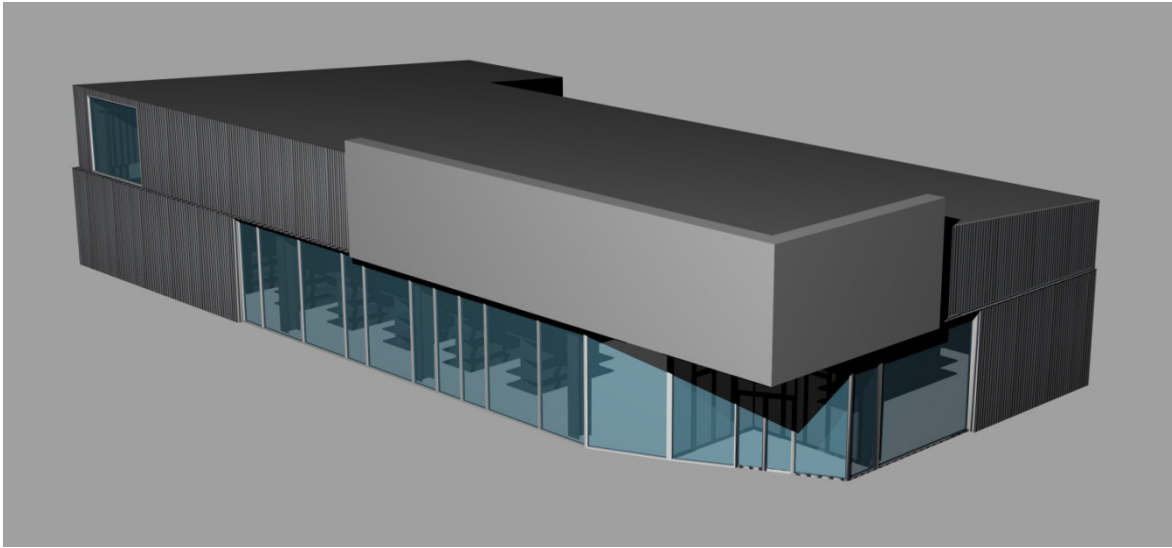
Case Study #3 – Typical Pre-Engineered Steel Single-Storey Retail Building
